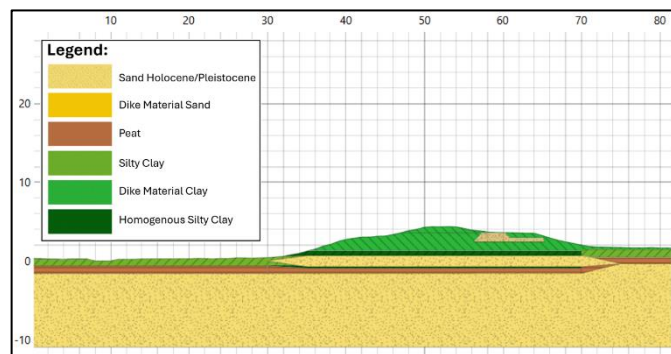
Soil composition and cross-section of dike section Wilsum-West (B)
